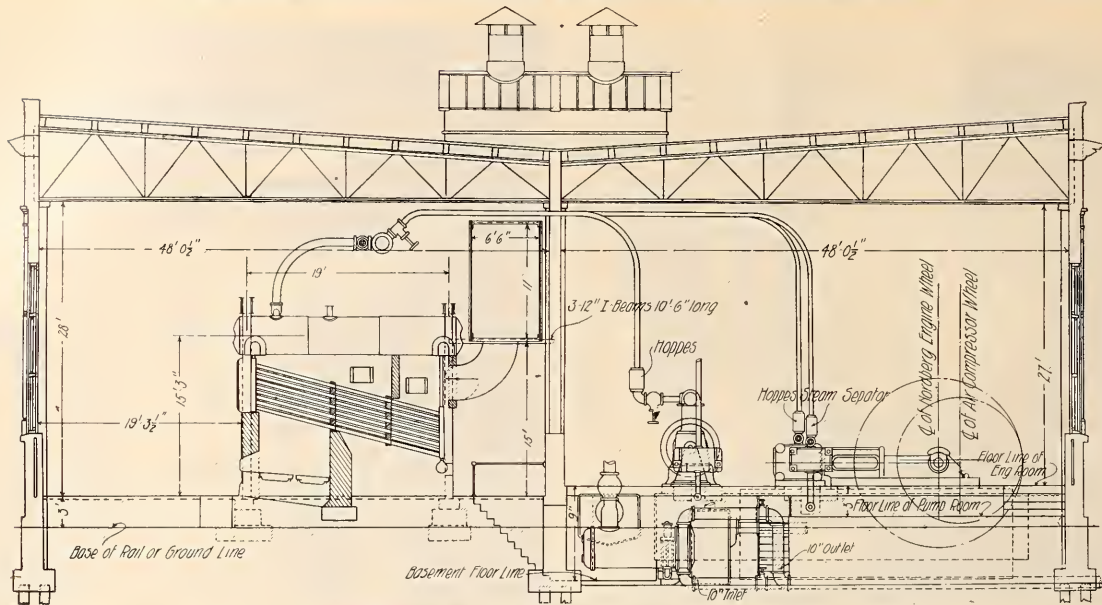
CROSS SECTION OF POWER HOUSE, C., M. & ST. P. RY.
